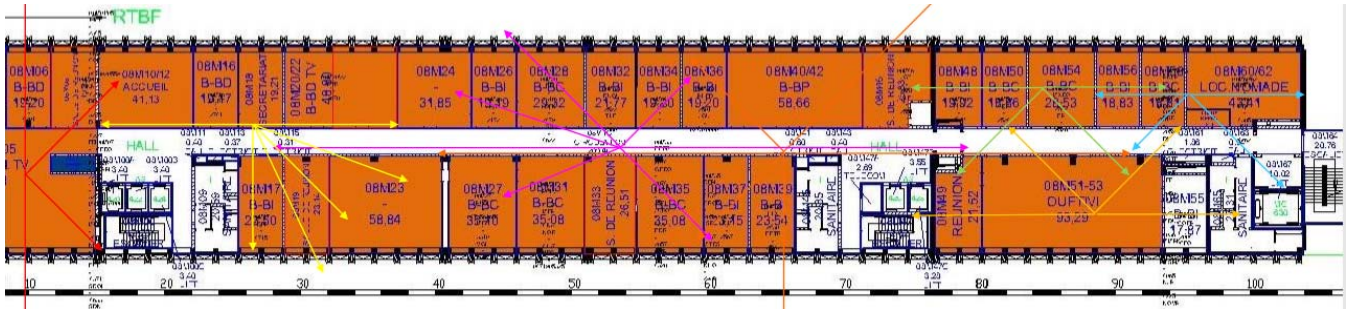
Design at 2.4 GHz for Floor 8 in Building CHJM
